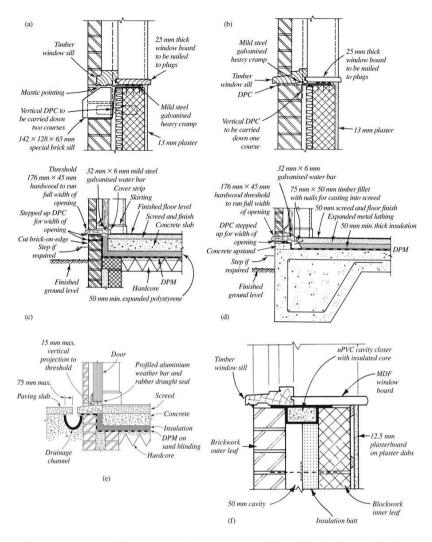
Sill construction: (a) combined brick and timber window sill; (b) timber window sill; (c) & (d) timber door threshold, with variation (e) for disabled access; (f) window sill with cavity closer.
